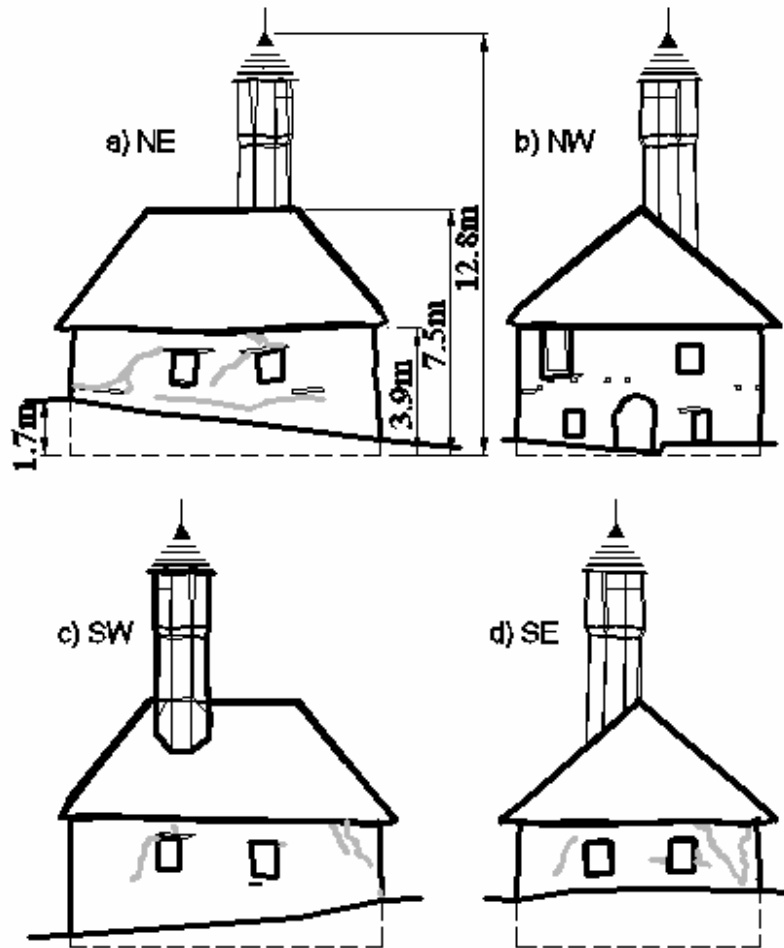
Façade a) northeast, b) northwest, c) southwest and d) southeast; crack pattern marked in grey
